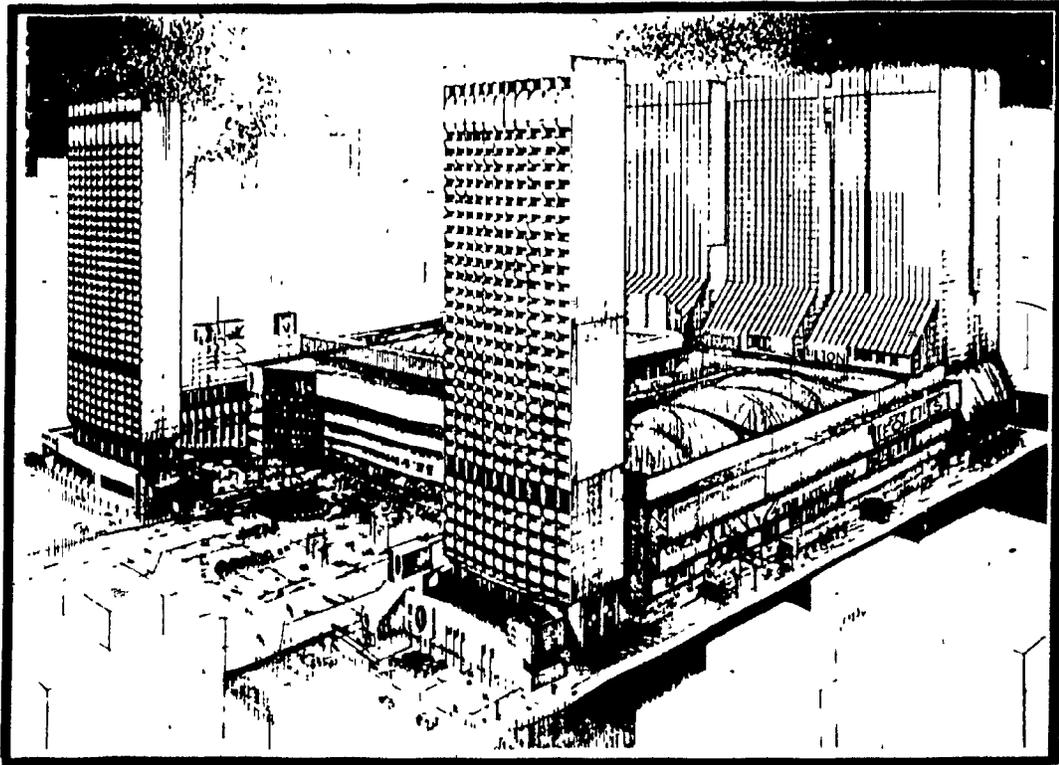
Proposed Merchants Convention City, New York City. A large convention-office-hotel-entertainment-retail complex which was to be built next to Rockefeller Center. Architects Katz, Waisman, Weber, Strauss.
